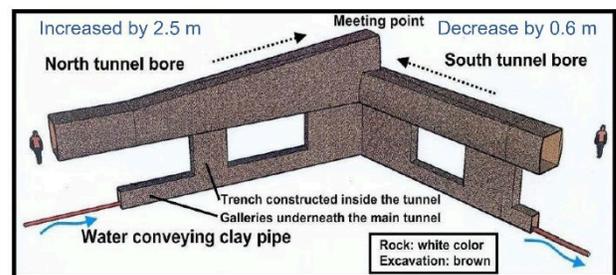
Horizontal and Vertical Plane alignment of Eupalinos Tunnel. Modified after Kienast, H., 1995.
